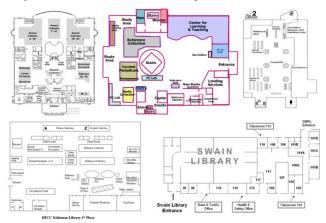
Some sample floor plans showing the breath of possible layouts.
